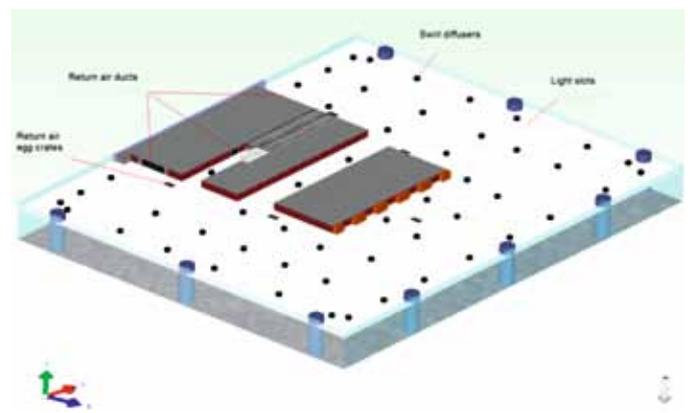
Northbridge Level 7 to Level 18 Typical Floorplan
